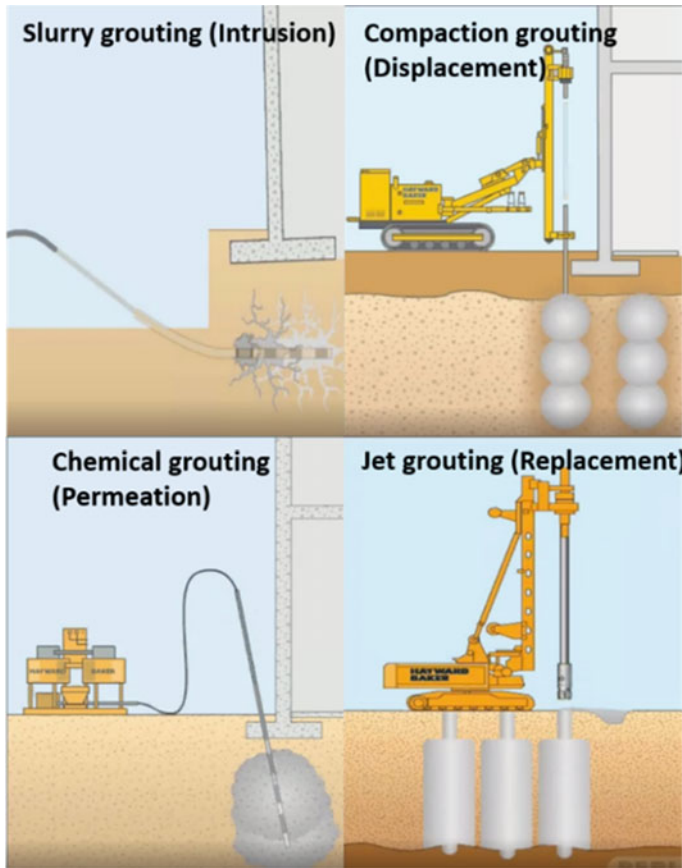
Types of grouting and applications of jet grouting (credited to Hayward Baker Inc.)
